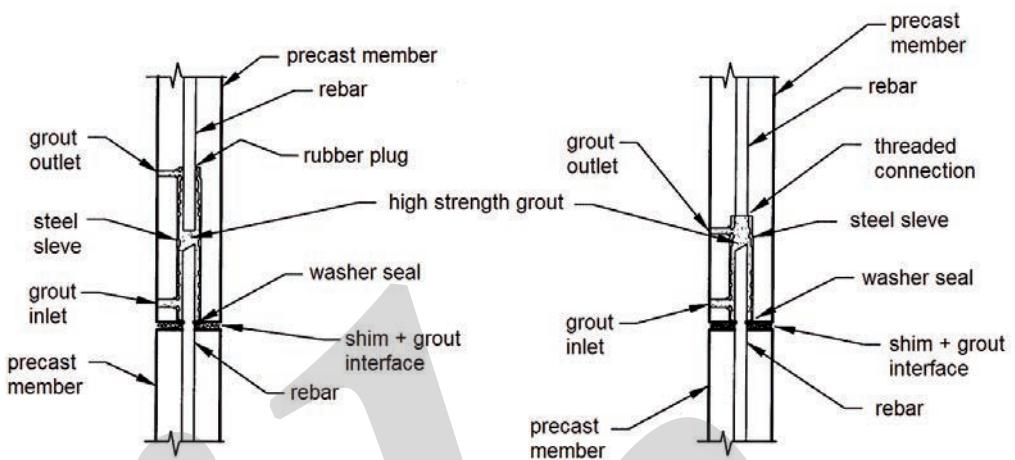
Typical types of mechanical splices using high-strength nonshrinking grout
